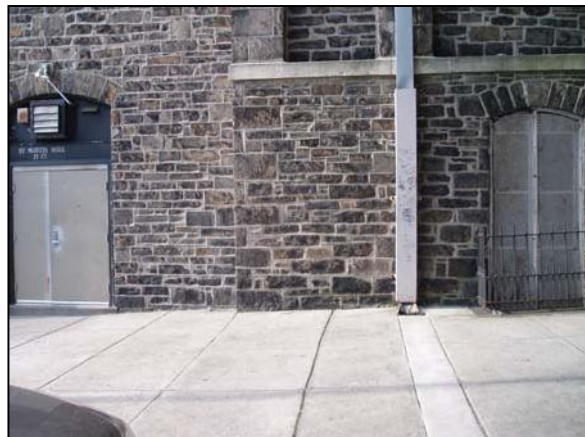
Proposed location of the stormwater planter, along the building between the window and corner (to the right of the door).
